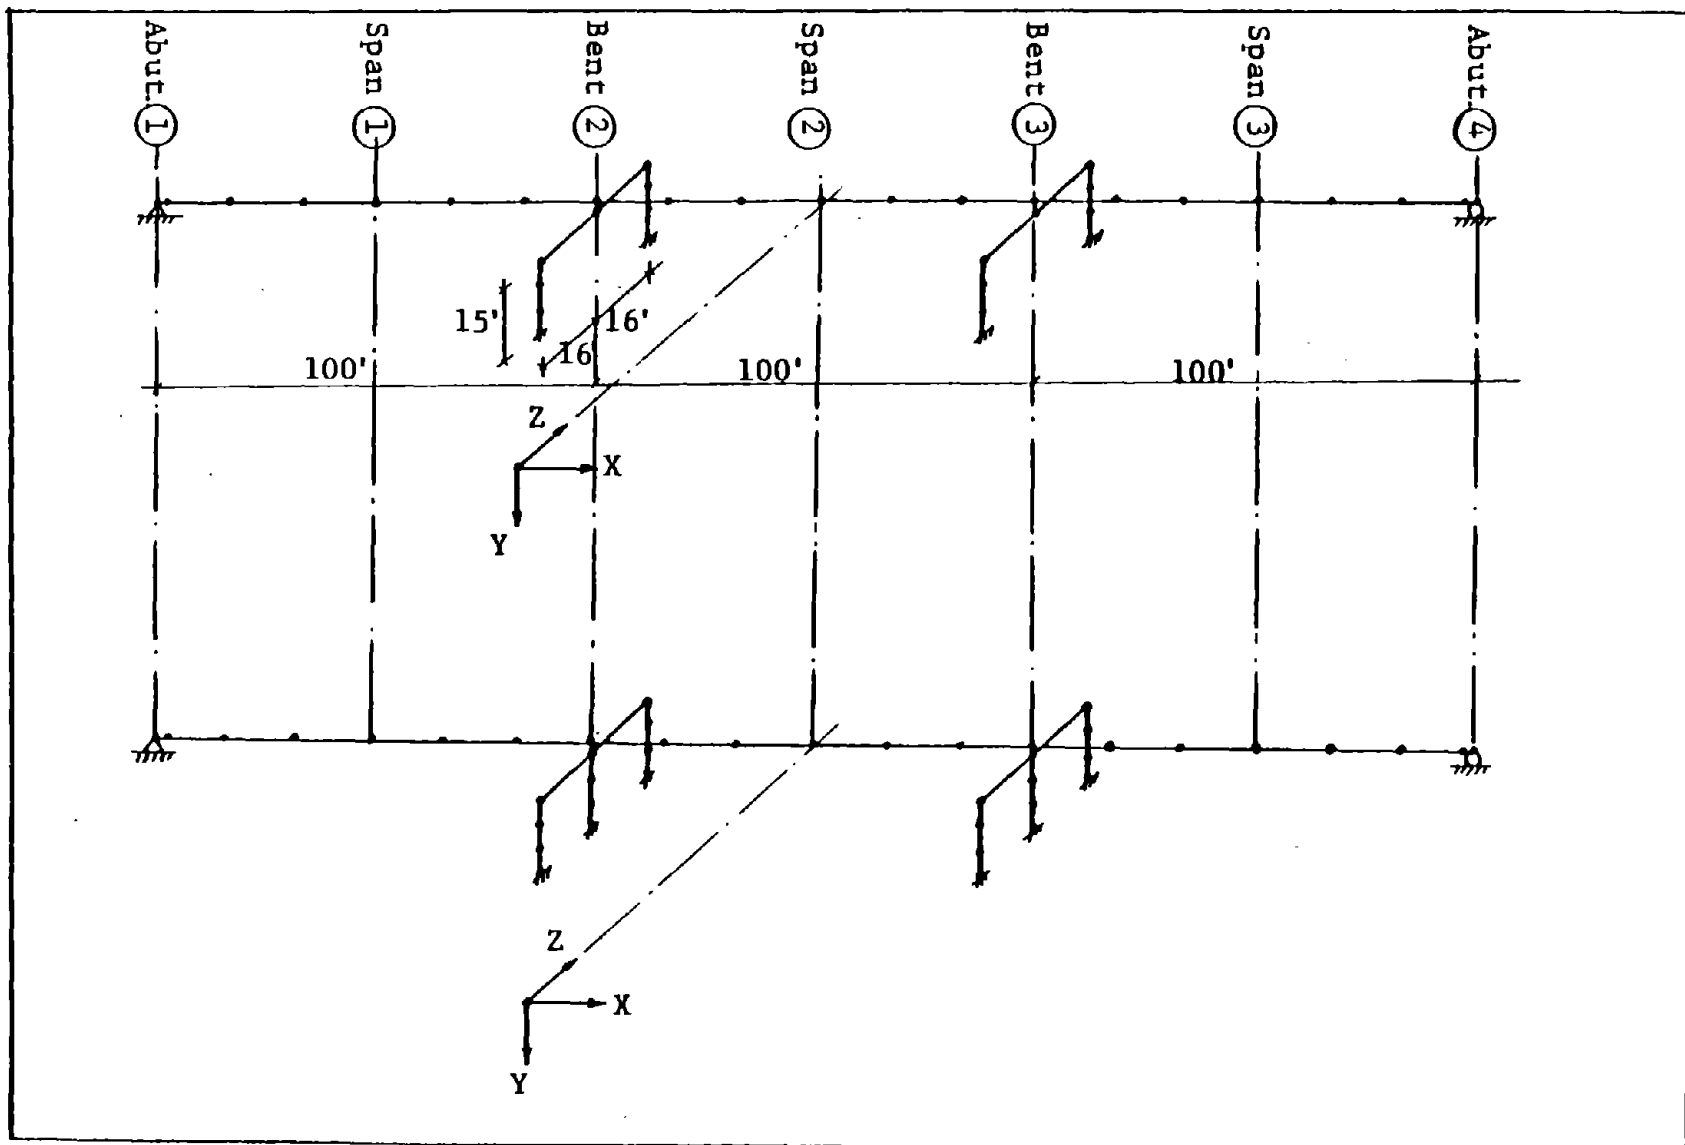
2-Column and 3-Column Models For a 3-Span Bridge
